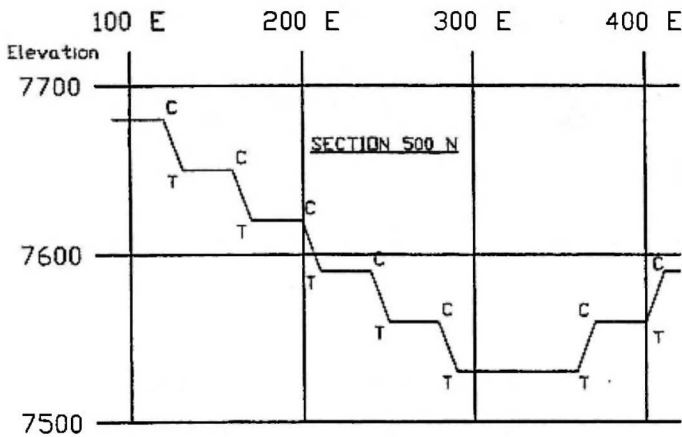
Cross-section through a portion of an open pit with toes and crests labelled.
